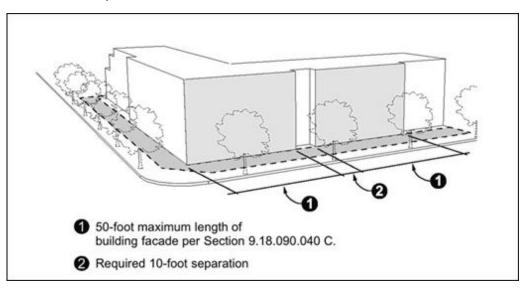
CC-1 Maximum Length of Building Façade
